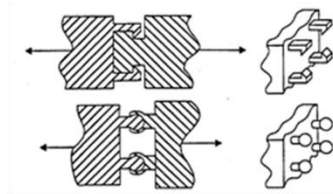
Applications of GFRP bridge deck with vertical snap-fit connection
